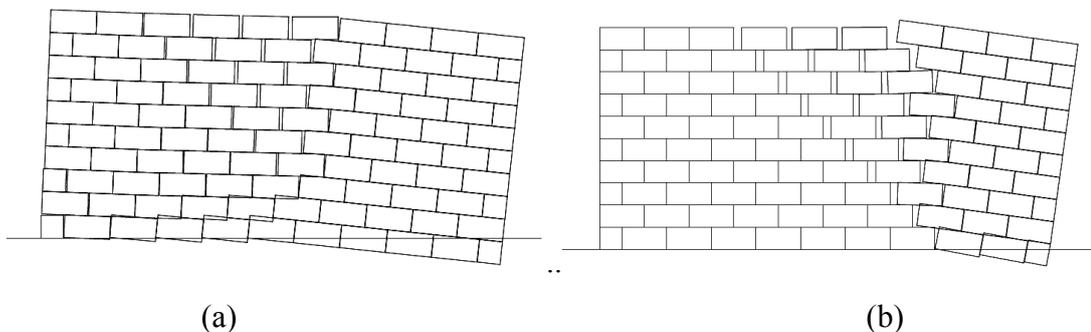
Typical failure mechanism for lower values of compressive stress, for 1MPa (a) with loading, (b) without loading
